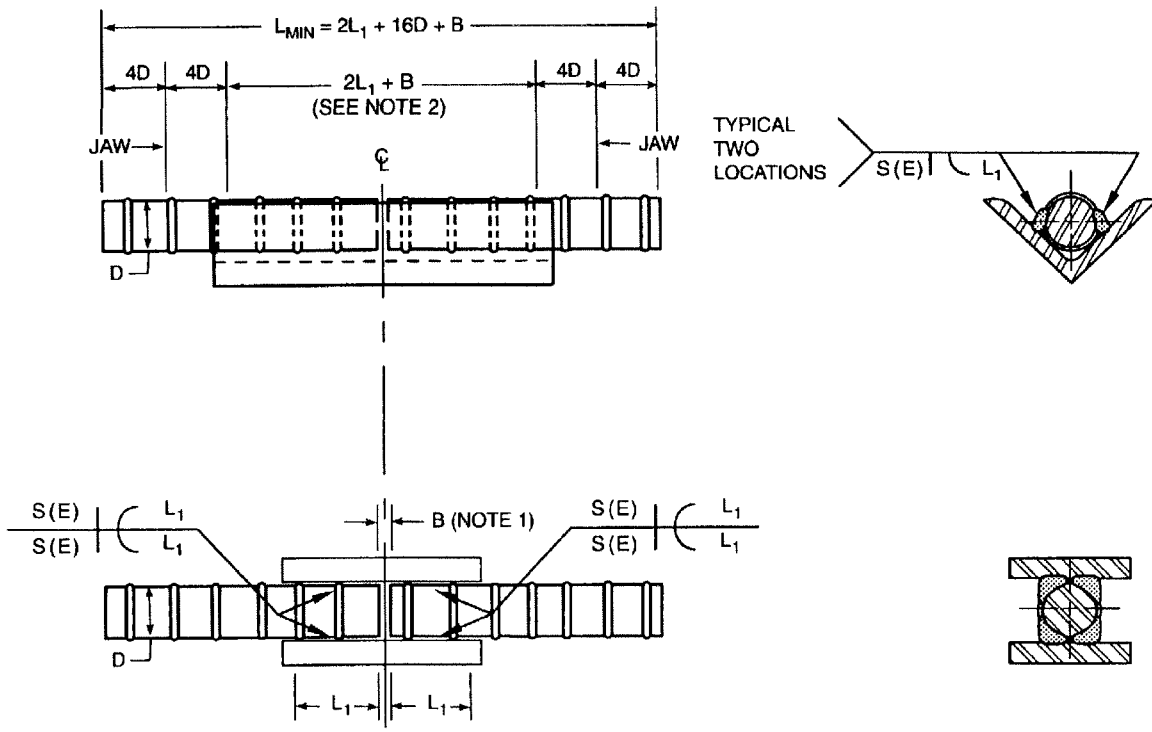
Positions of Fillet Welds (see 6.2.3)
